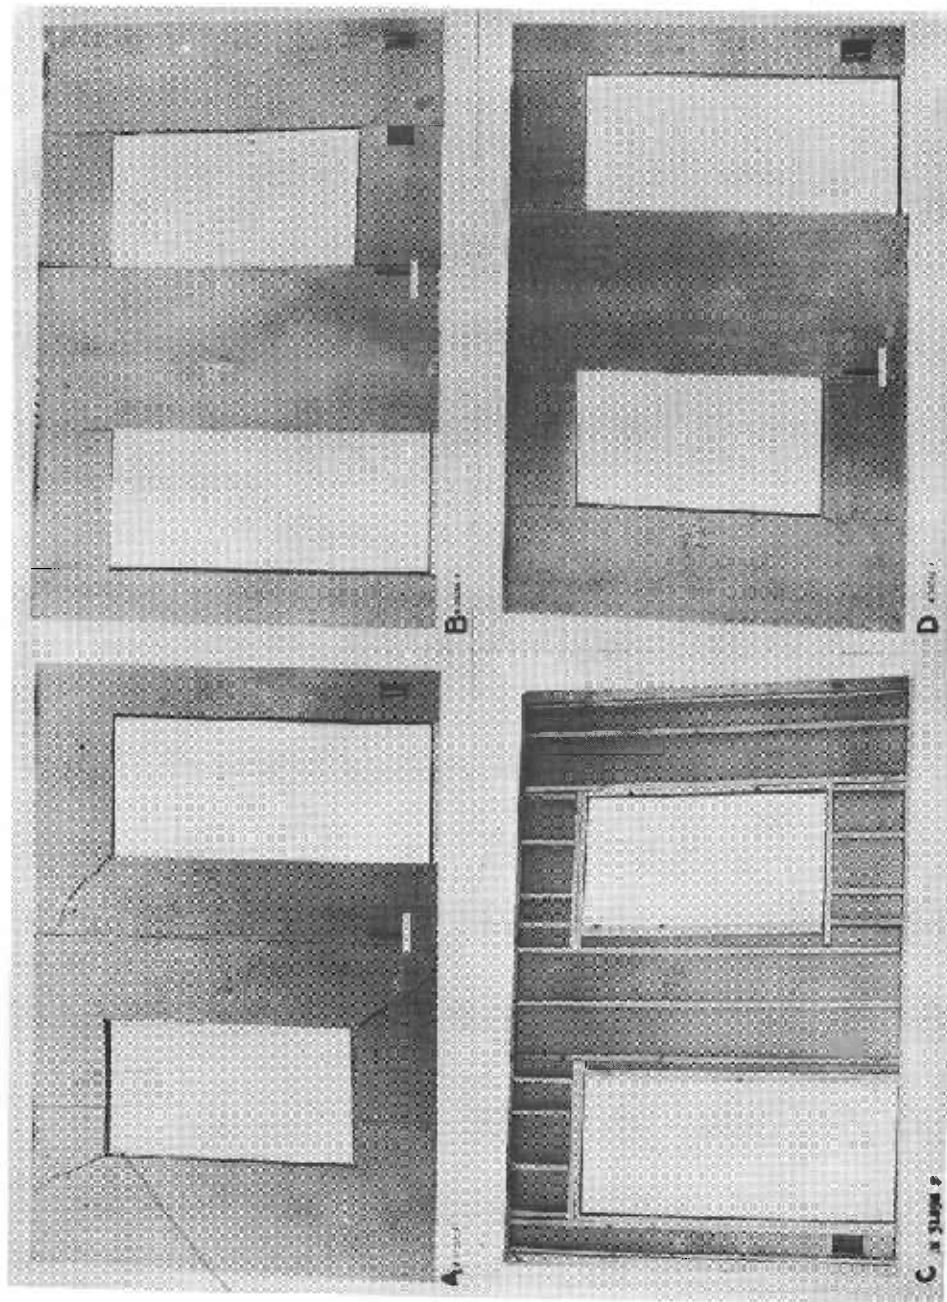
Fiberboard-sheathed panels after racking tests. A, Typical failure in panels with sheathing sawed to fit openings. Test load applied at left end of upper plate. B, Sheathing applied in full-length sheets without reentrant angles. Objectionable failures shown in A eliminated. C, Fiberboard applied as in B, but 2- by 4-inch stubs inserted above door and window openings and below windows to provide additional nailing for sheathing. D, Opposite face of panel C showing nailing of sheathing to short reinforcing stubs. (Plumb bob shows distortion of sheathing after test.)
